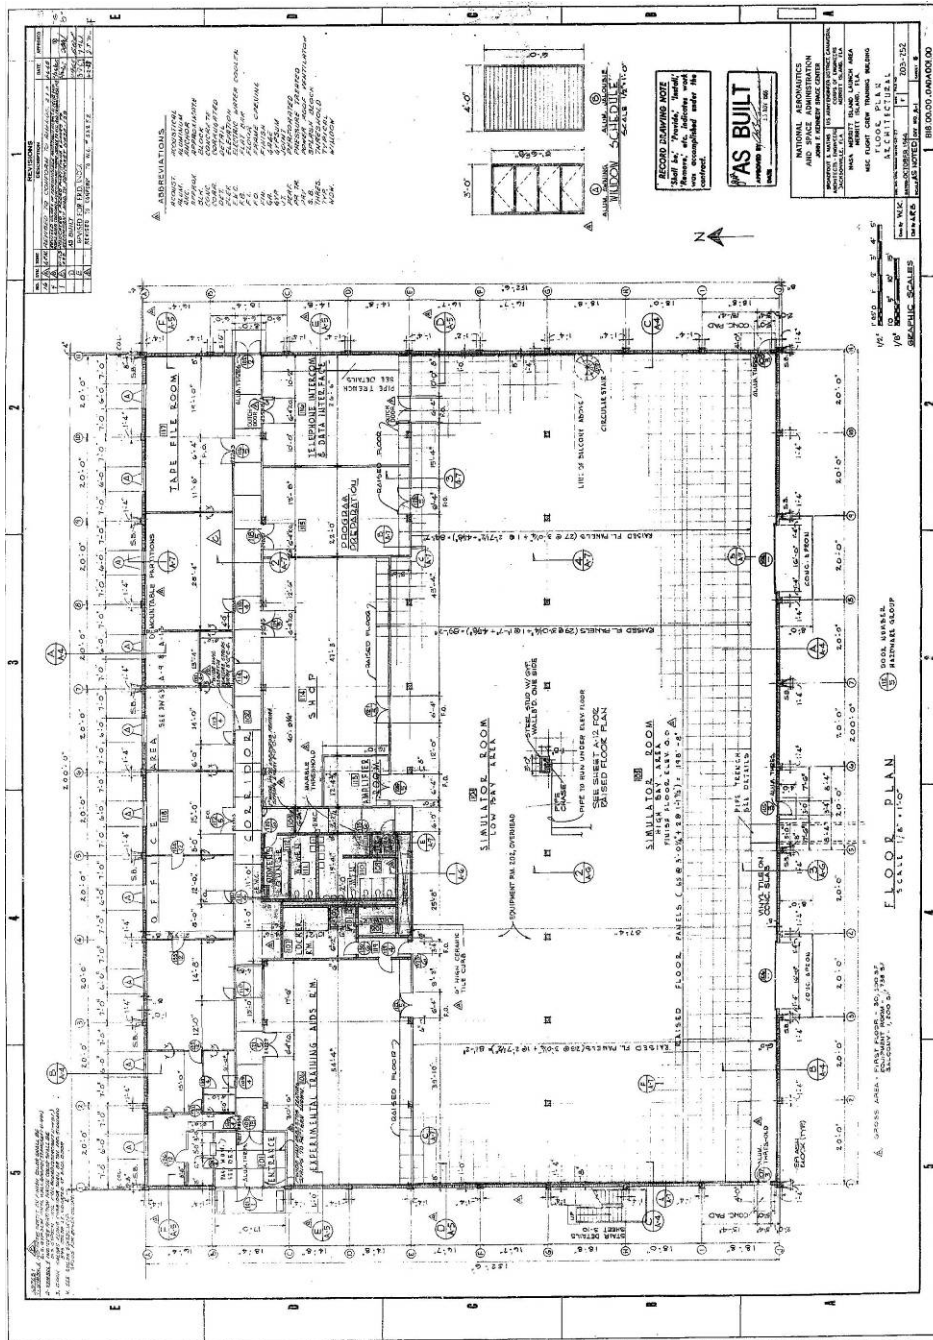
Broadfoot & Mathis, Flight Crew Training Building, First Floor Plan, October 1964, Sheet 6.
